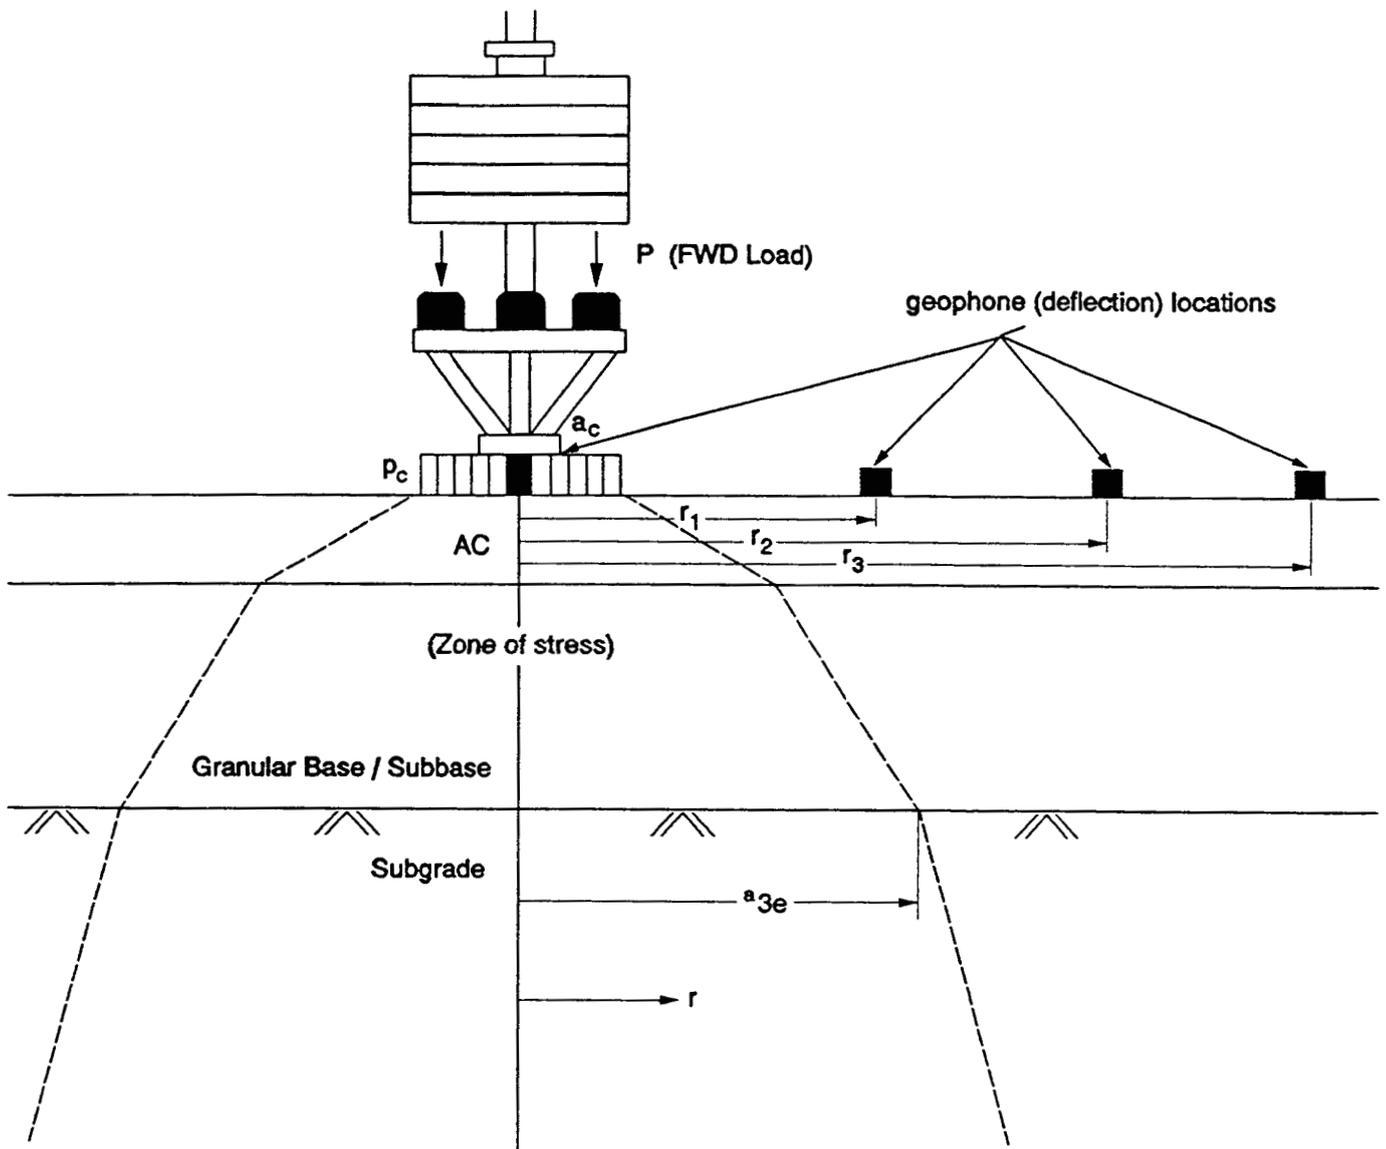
Schematic of stress zone within pavement structure under FWD load.
